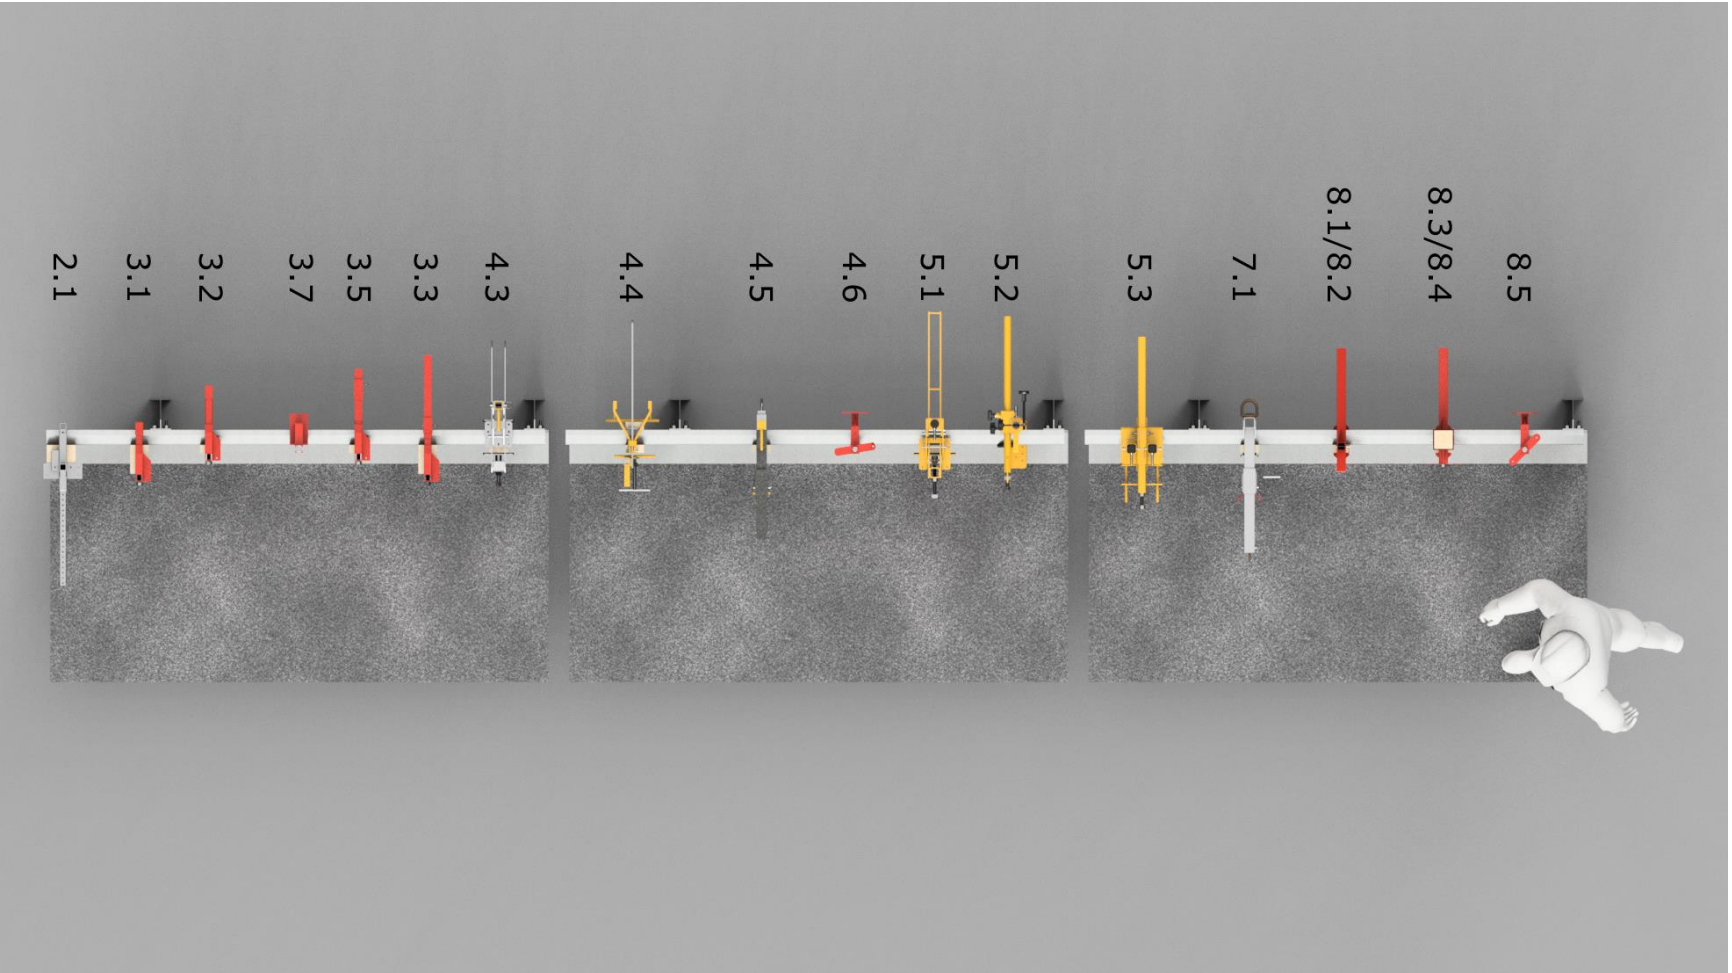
Guardrail Type 23, guardrail fit; view from the top
